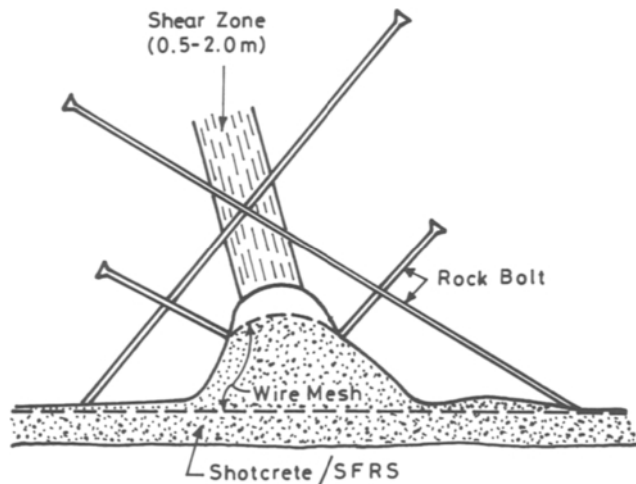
Shear zone treatment in an underground opening (Lang, 1971)
